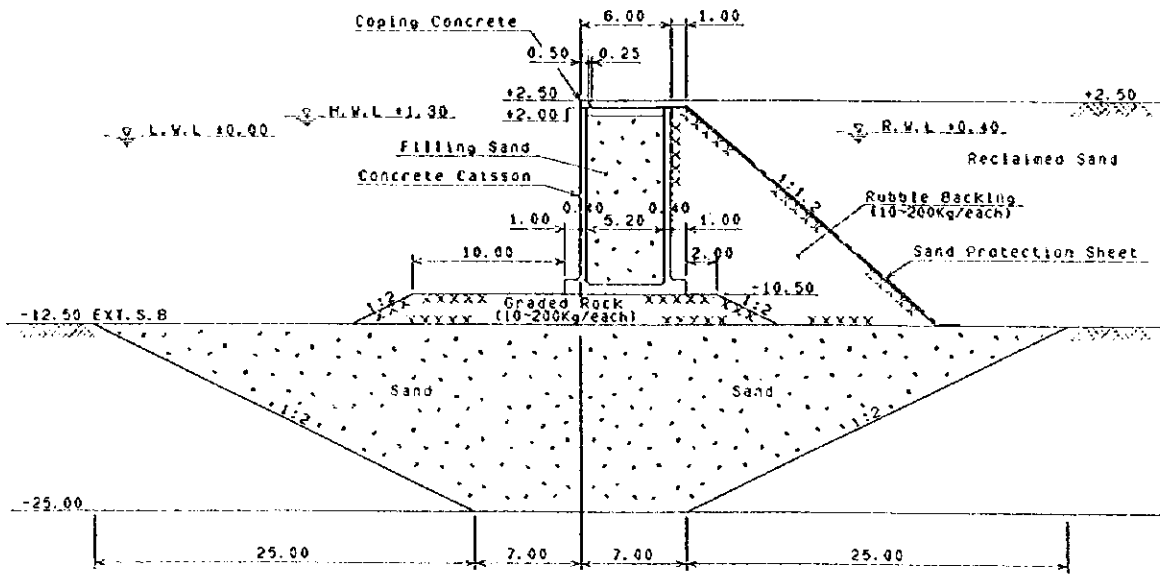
(1) Typical Cross Section of Revetment 1 (RC Caisson)
